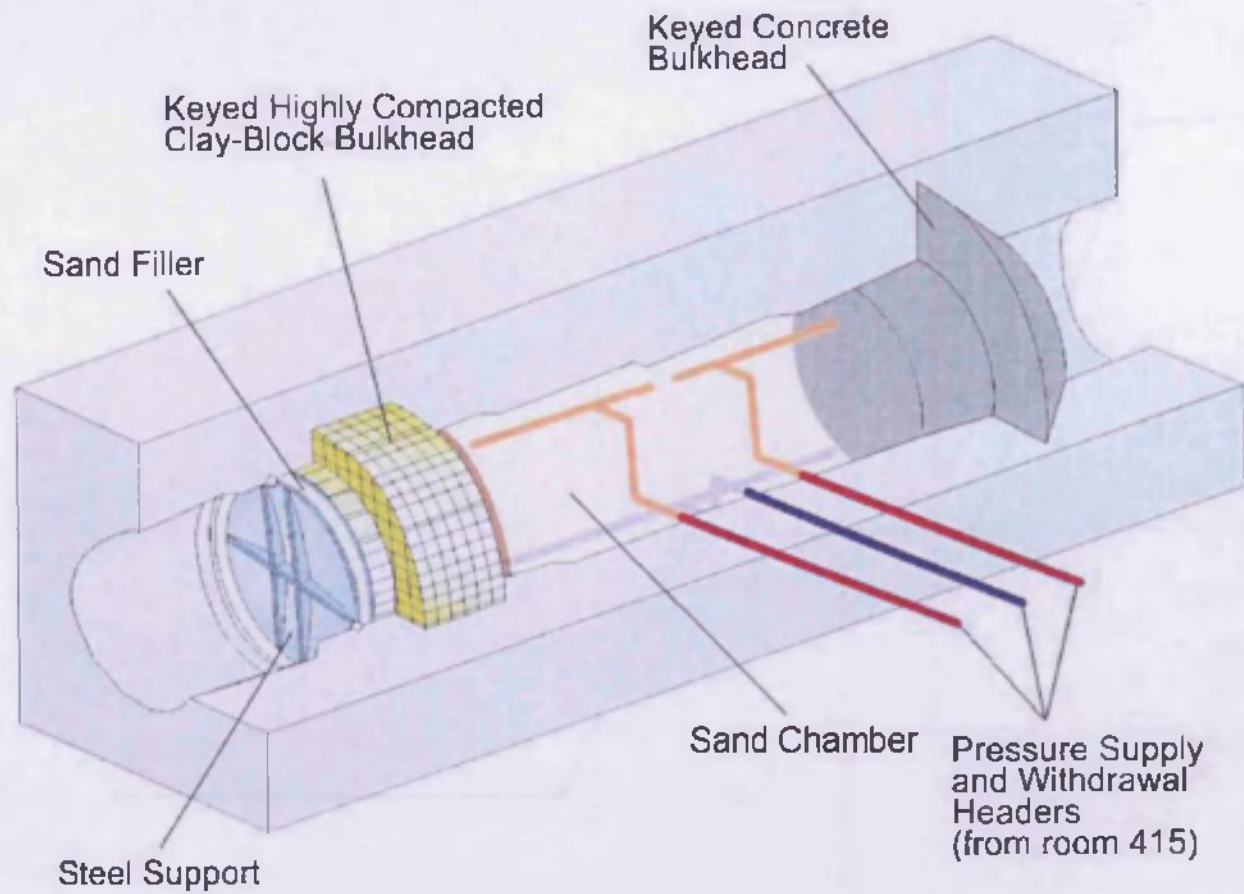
Layout of the Tunnel Sealing Experiment (Chandler et al., 2002b)
